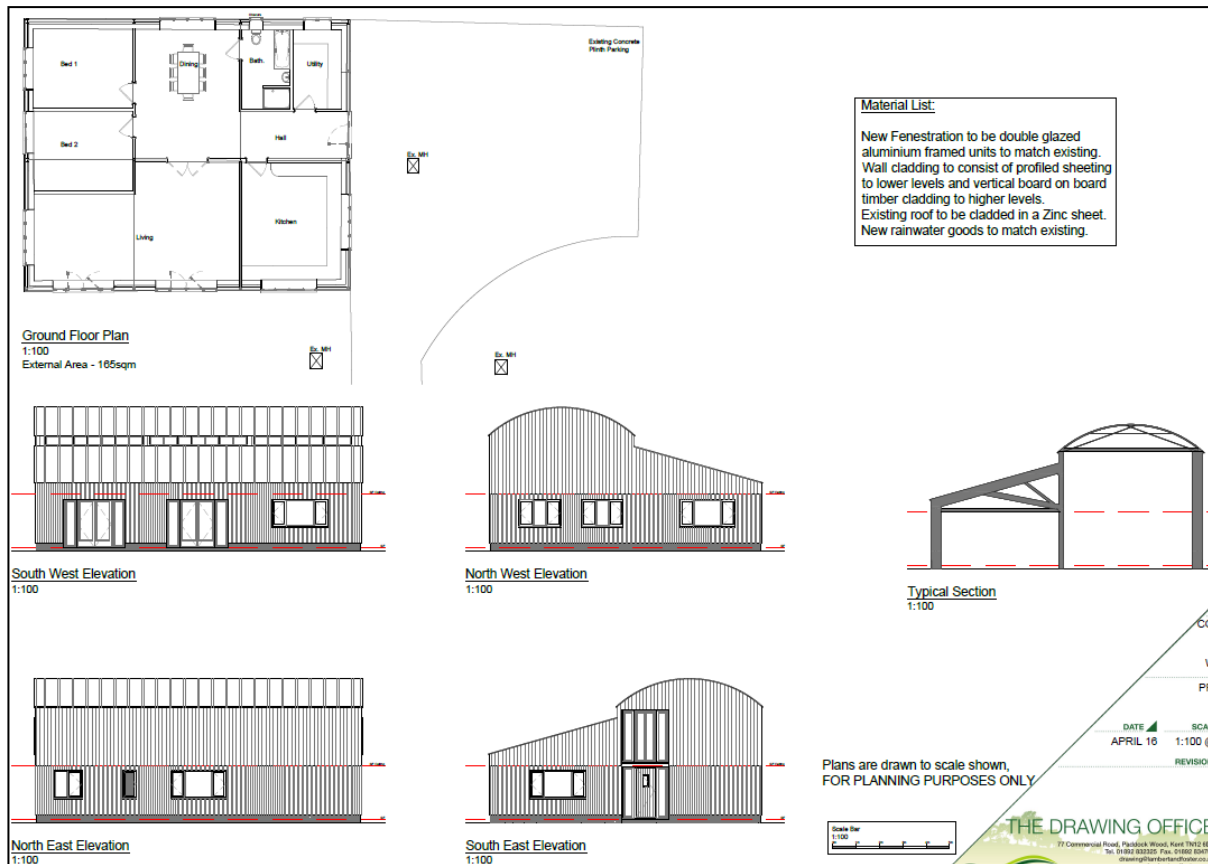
Plans approved under Prior Approval application 16/00644/AS
